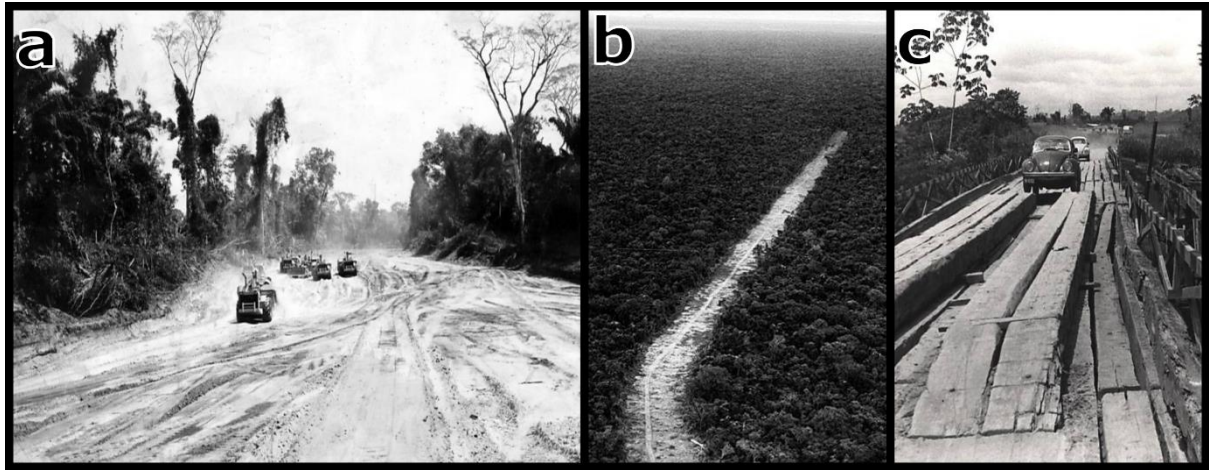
Transamazon highway under construction (early 1970s): (a) machinery working to make the backfill. Source: (Folha de São Paulo 2016); (b) opening the primary forest frontier. Source: (Folha de São Paulo 2016); (c) cars crossing the bridge made of wood. Source: (Folha de São Paulo 2016).
